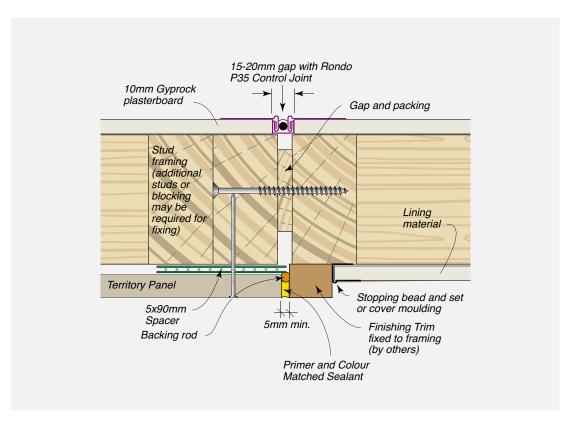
Typical Detail Junction with Fibre Cement Cladding System - Plan View
